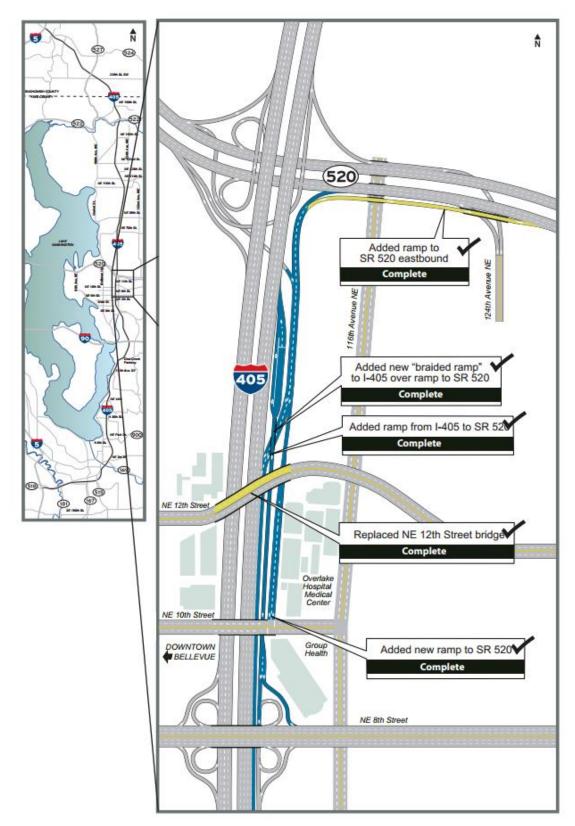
Design and layout of I-405 Braided Ramps Project.
